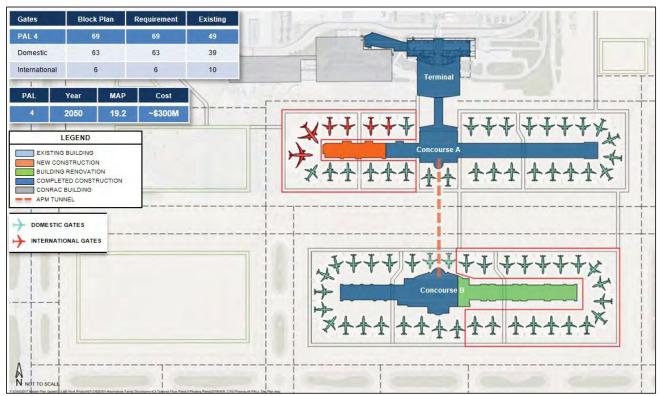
PAL 4 SITE PLAN
